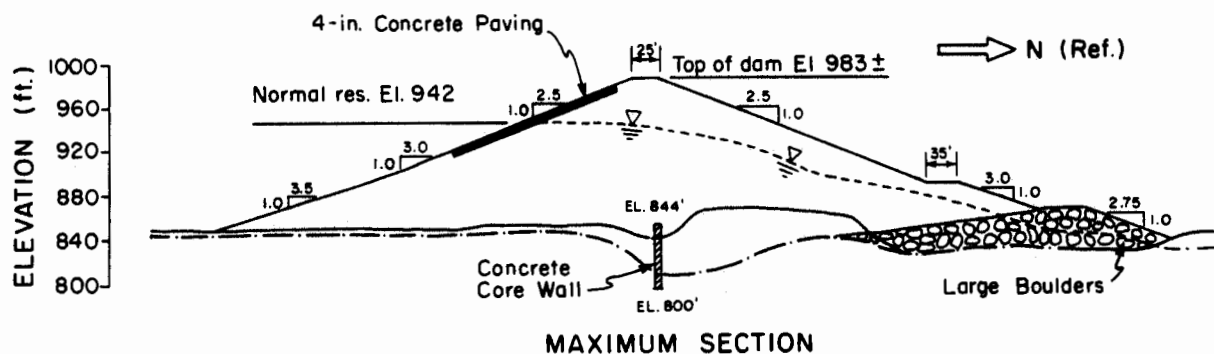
Cross-Section Through the Maximum Height Section of Puddingstone Dam
